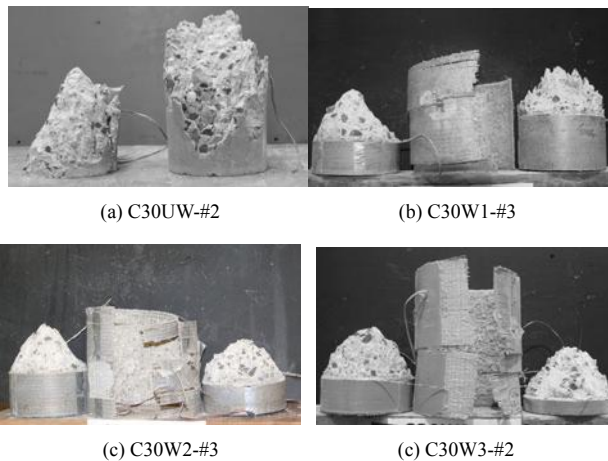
Typical failure modes of unwrapped and SFRP wrapped concrete cylinders. Unwrapped: (a) 30MPa–shear failure; Wrapped: (b) one layer–SFRP rupture; (d) two layers–rupture/debonding; (e) three layers–debonding at the overlap
